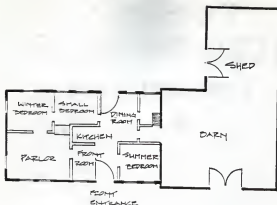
Floor plan of the German-Russian Mennonite adobe house.
